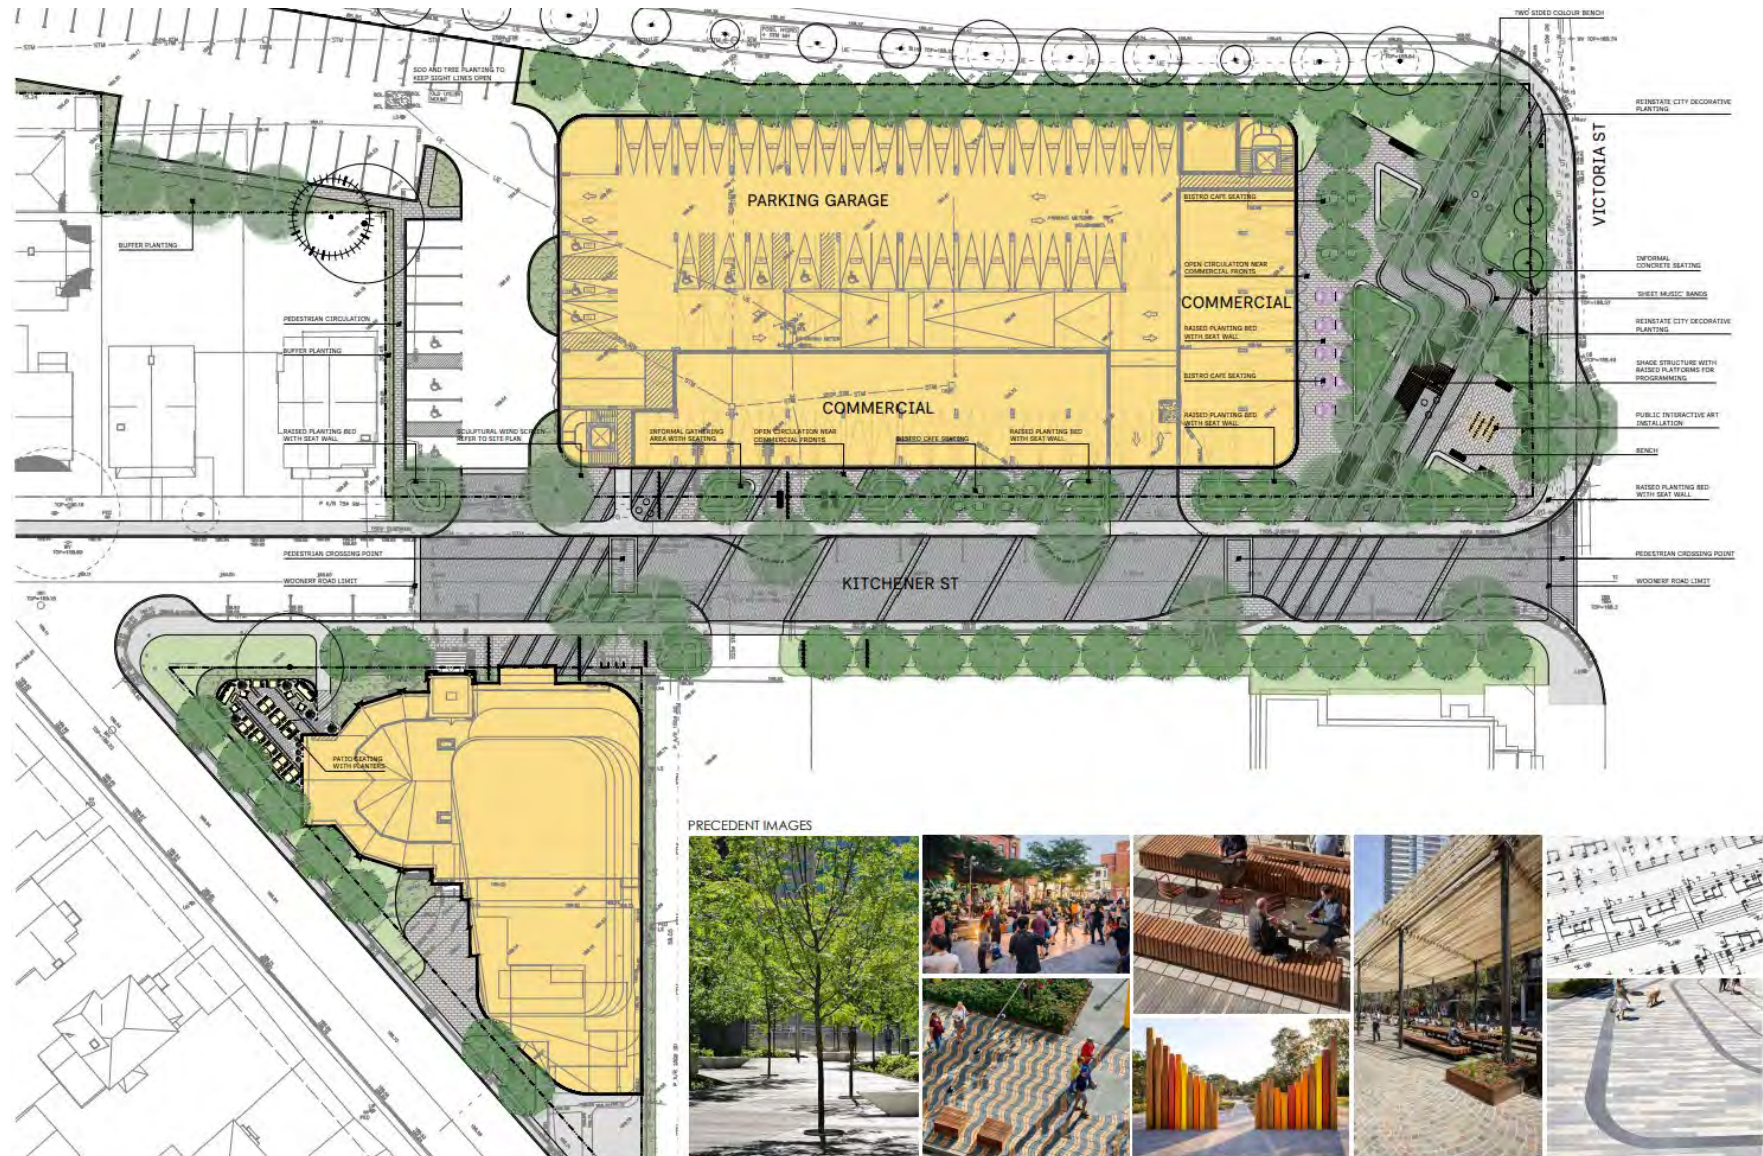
Preliminary Landscape Plan for 4873 Kitchener Street (Source: Adesso design inc., 2026)
